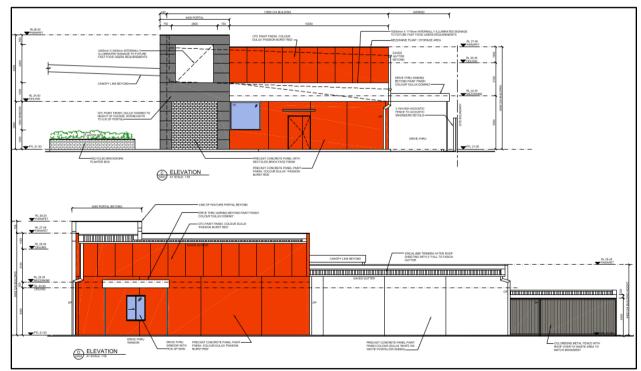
Elevations of the service station building viewed from the street (top) and public reserve (bottom)
